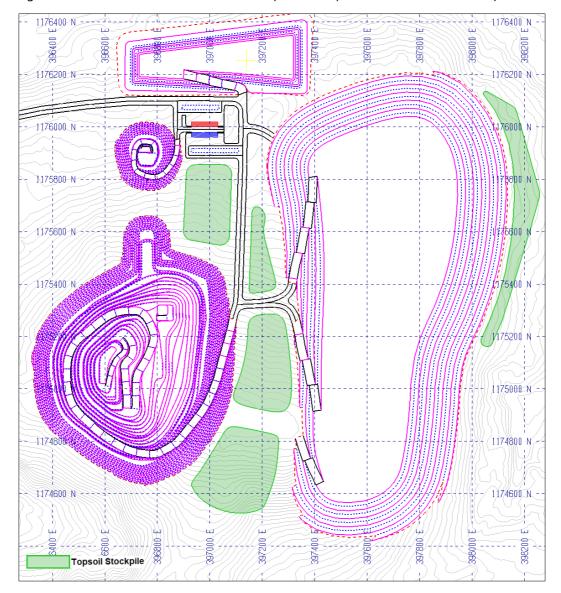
NEB/GBE Topsoil Stockpile Layout
